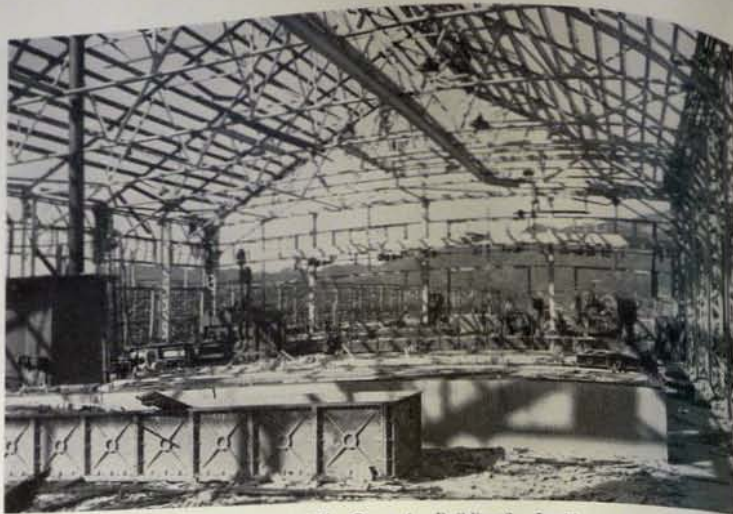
5,400 feet from GZ. Group 4. Building 2. Looking west.
